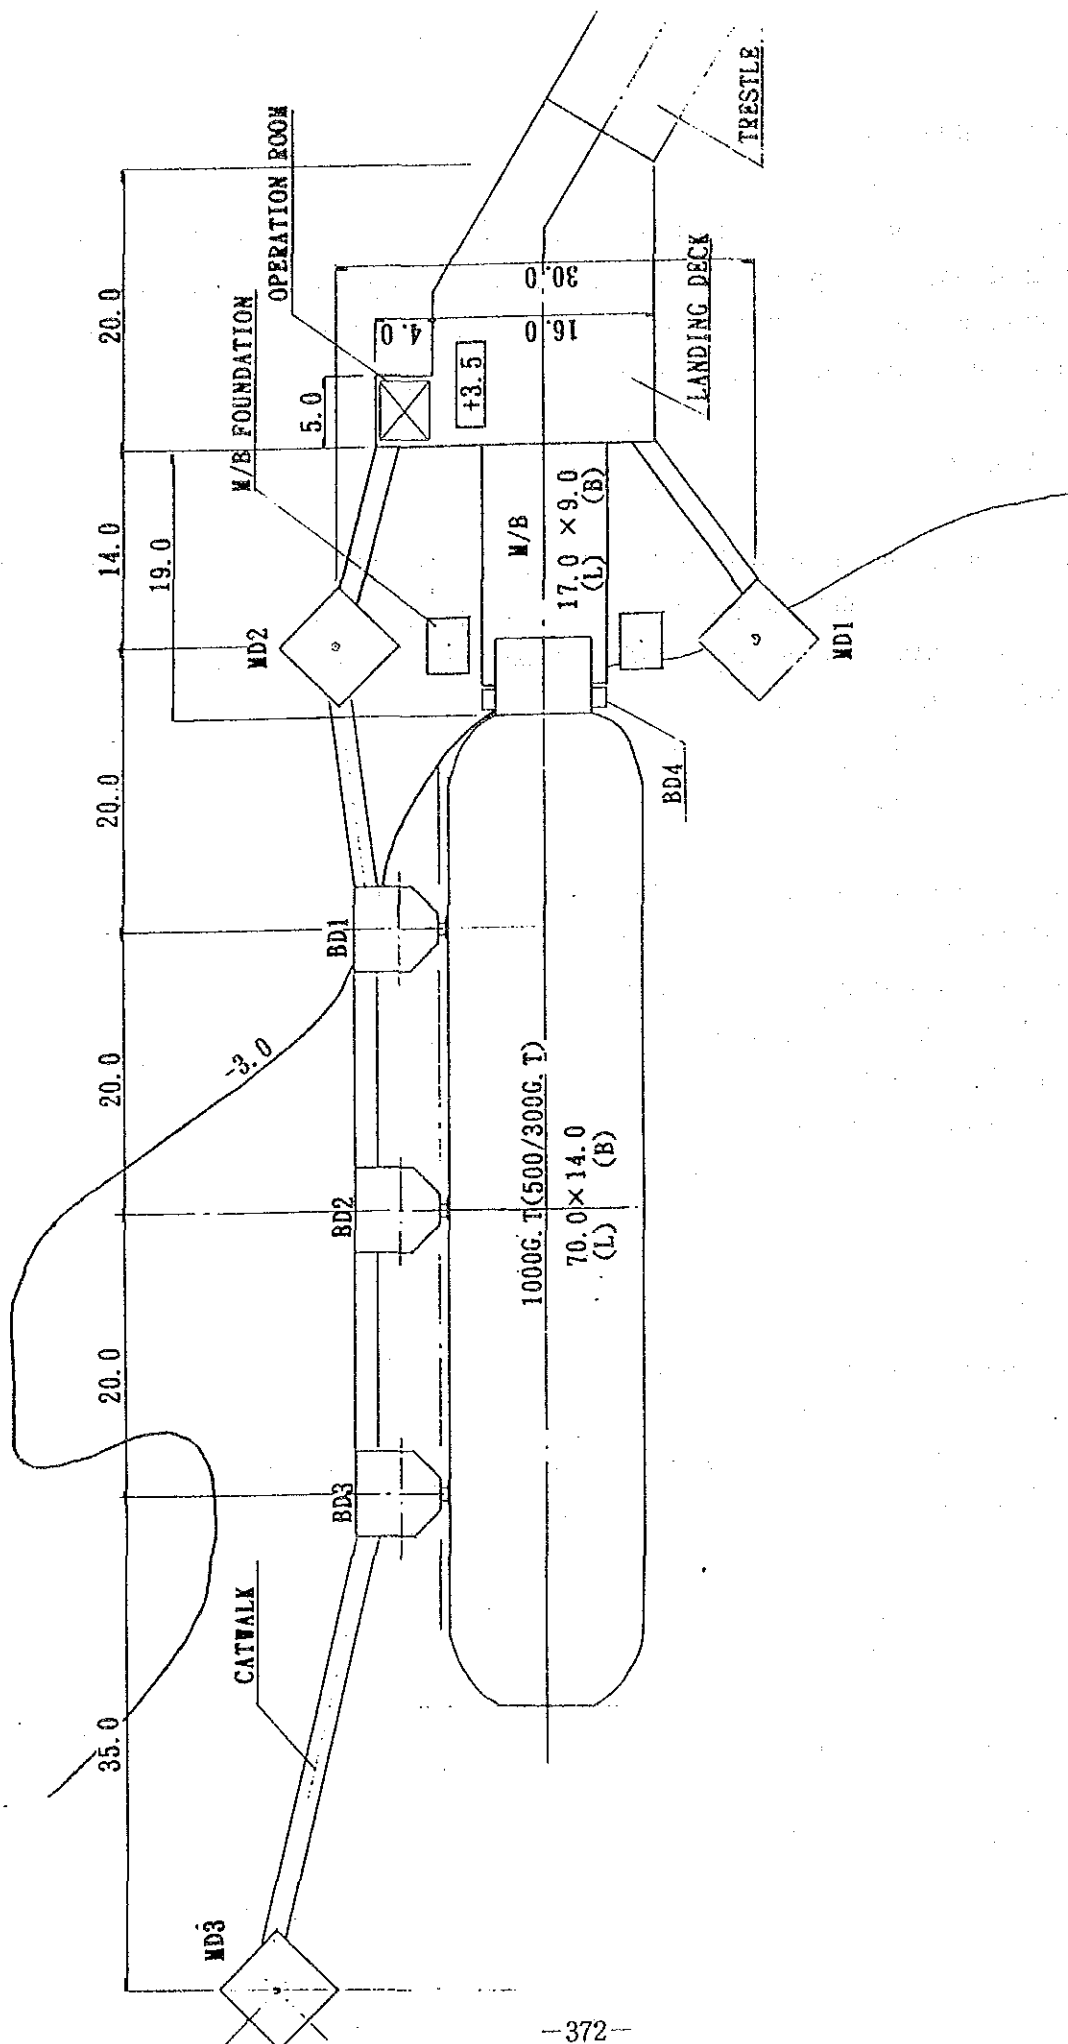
Layout of Mooring Facilities of Kolaka Ferry Terminal
